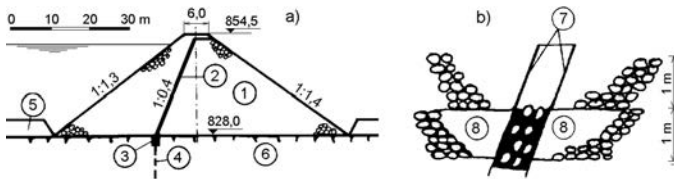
Lastioules Sud dam (France). (1) Rockfill; (2) asphaltic core; (3) asphaltic cutoff trench; (4) bituminous grout curtain; (5) sediment; (6) bedrock (granite); (7) steel formwork drawing outwards; (8) compacted schist.
